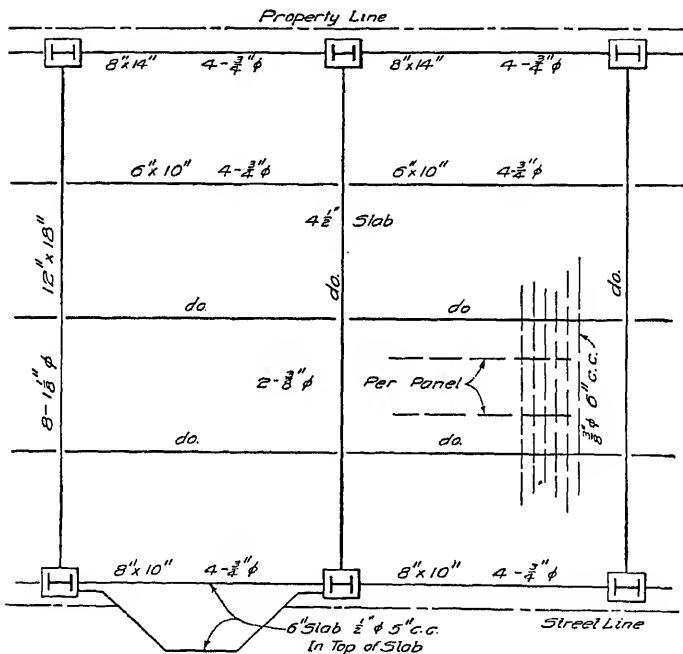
Plan of Two Bays of a Floor in Allman Building, Philadelphia, Pennsylvania
